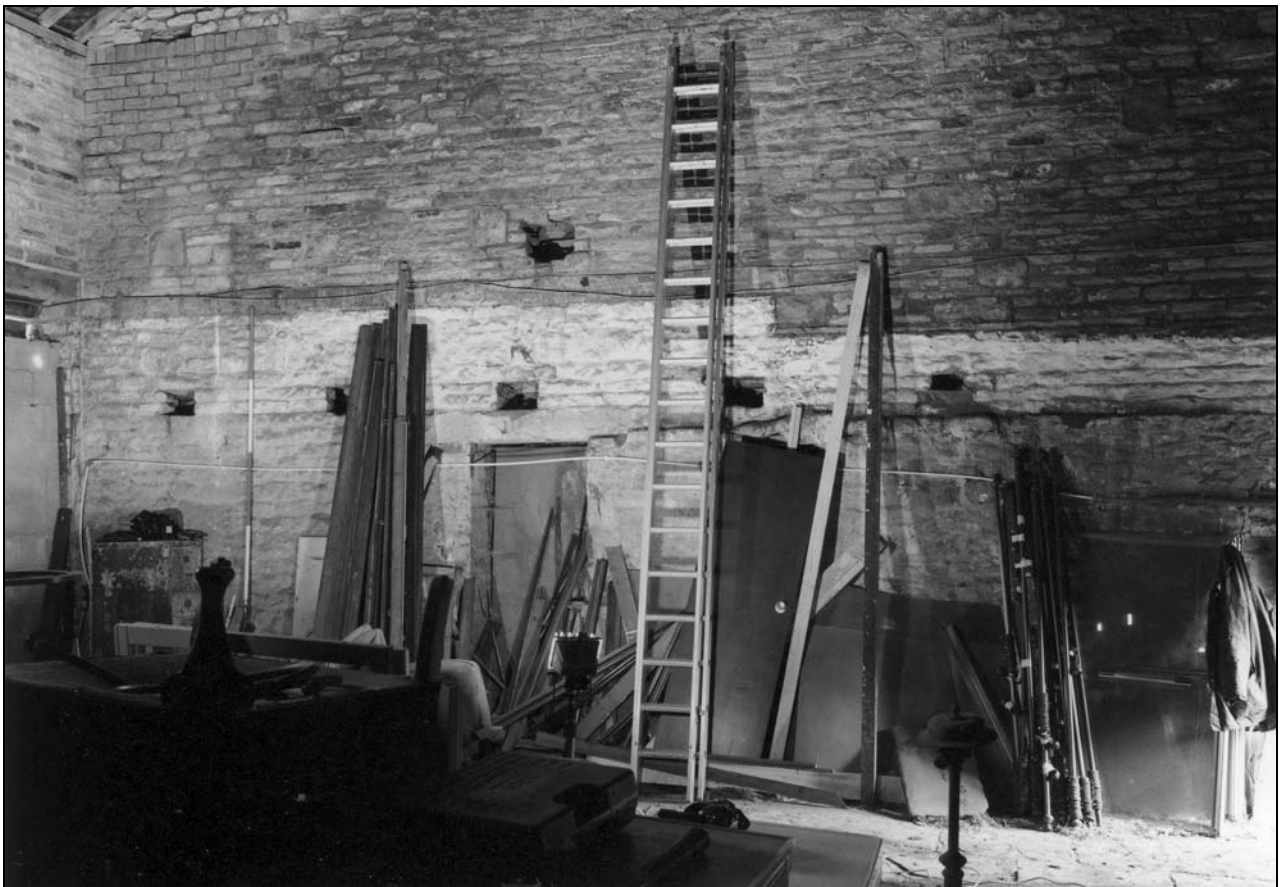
Building 1 (barn): interior view of east gable with sockets of former loft (film 1, frame 3)
